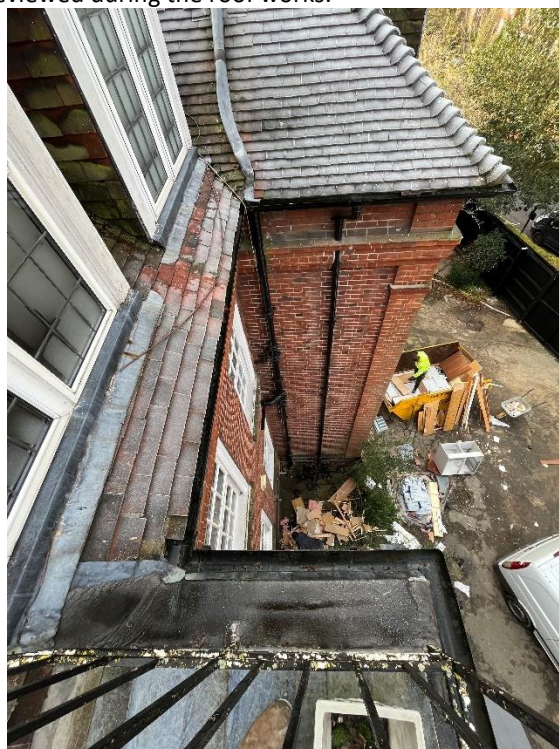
Views looking down in the recesses either side of the central projecting balcony. The dormers feature lead flashing and there are four rows of clay tiles to the eaves. The property features a mix of cast iron and uPVC gutters. It is proposed to replace any uPVC with cast iron.
